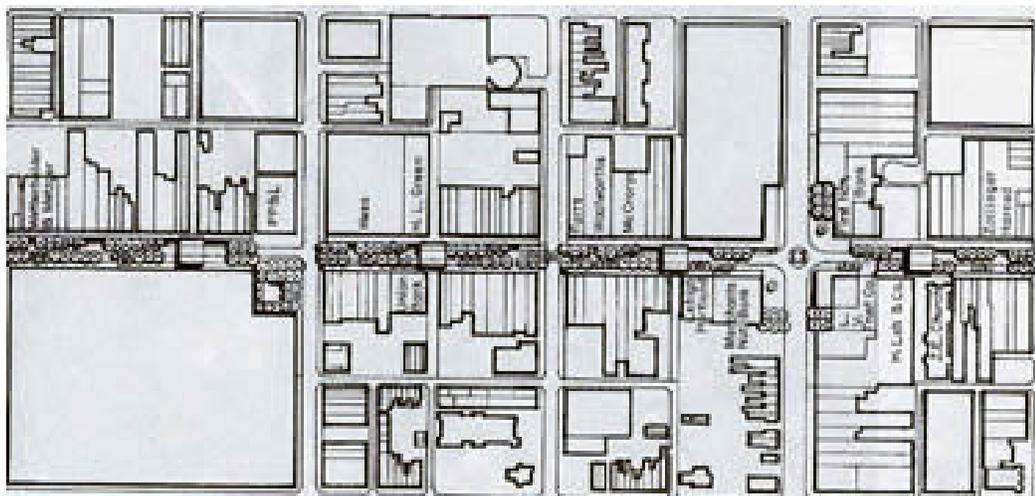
Plan of Hamilton Mall (Rubenstein, 1992: 167)
